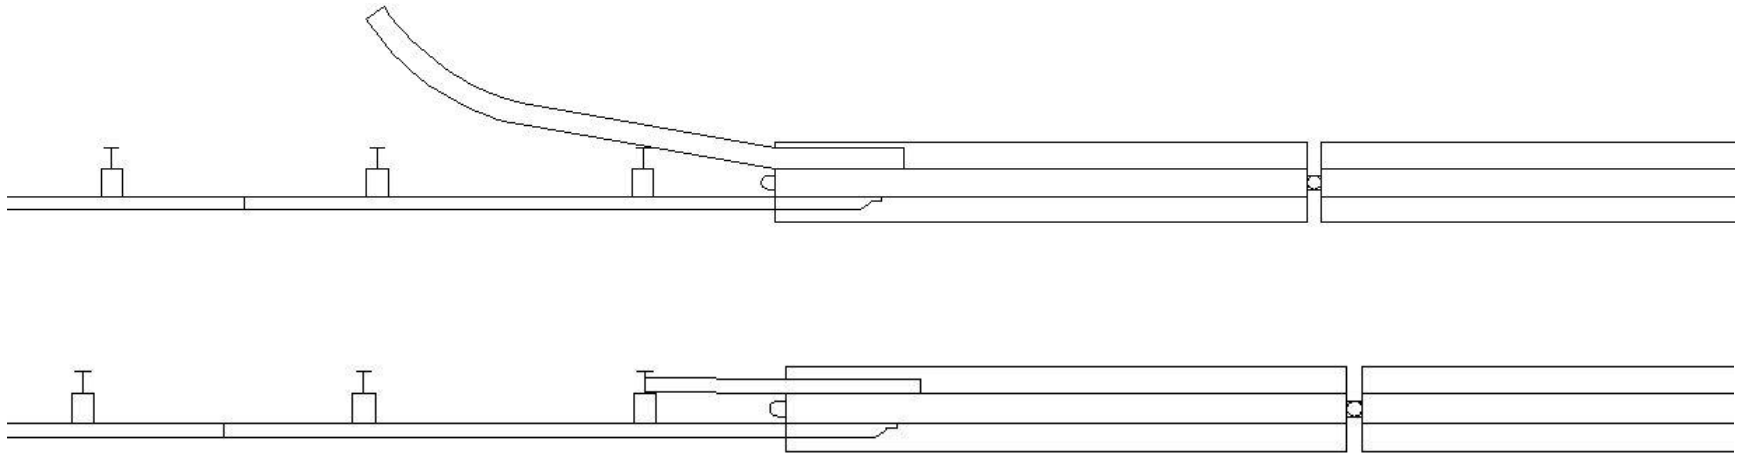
Parallel PCB – Modified G4(1S) Design Concept
